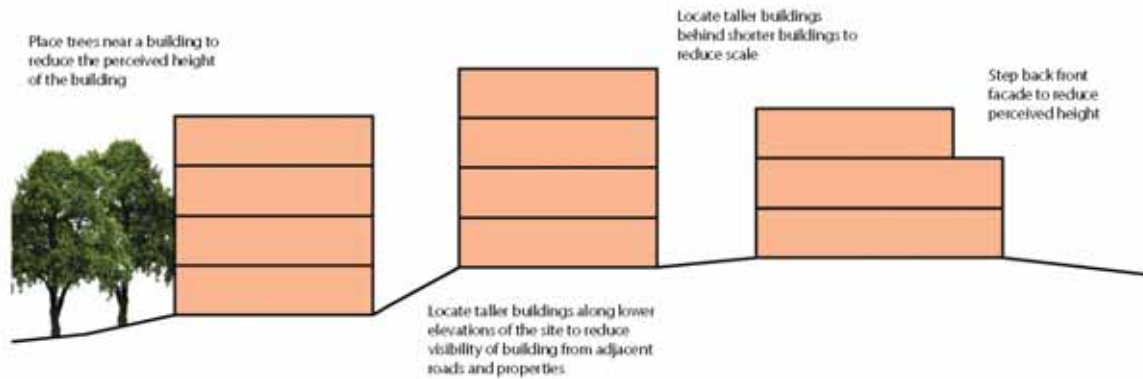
A diagram of multi-story buildings placed in a development site using the existing or proposed topography.
